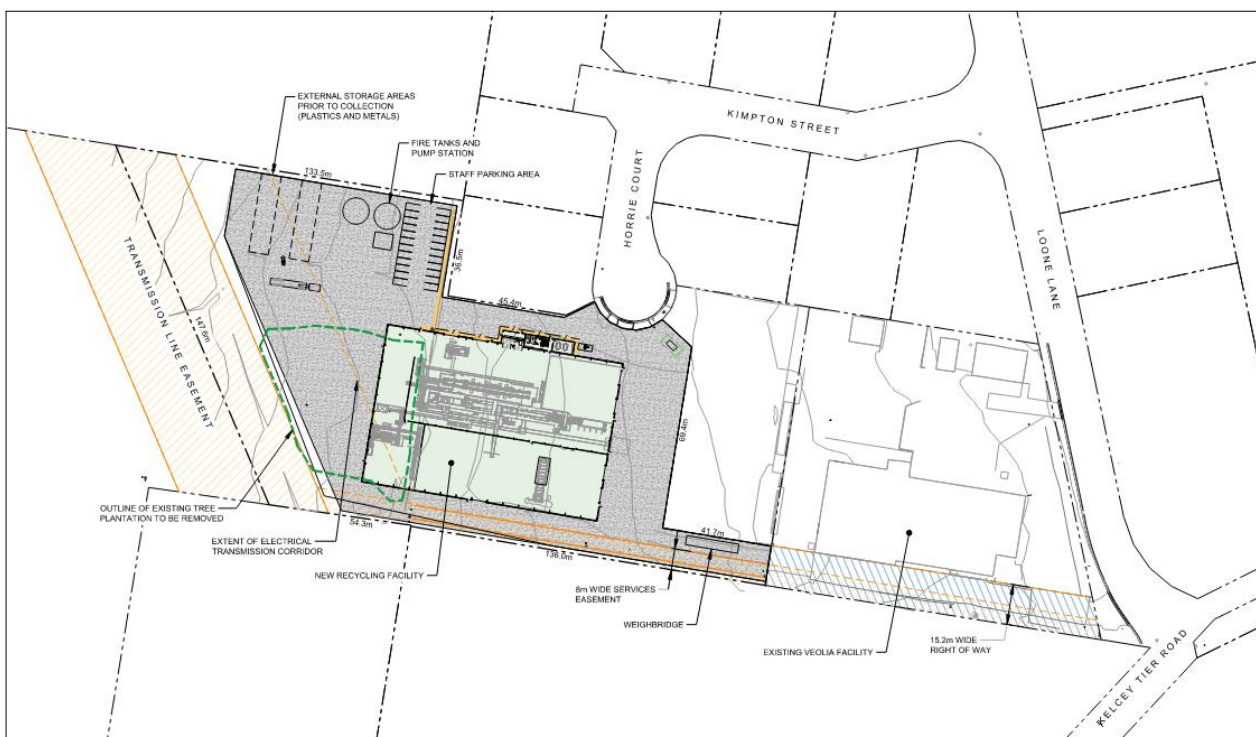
Location plan (Tasmanian Consulting Service, 2022)
